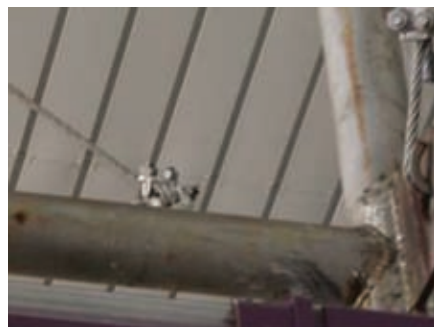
Active corrosion on galvanized pipe support for overhead lighting fixtures
